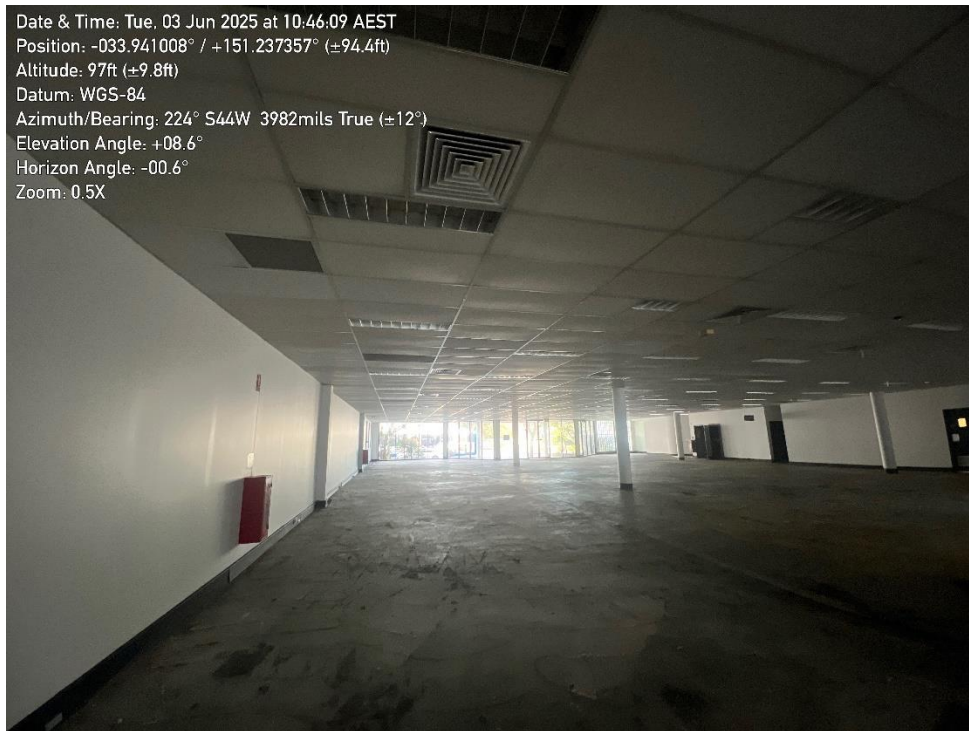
Interior view of the building at 138 Maroubra Road, looking toward the glazed façade and adjoining landscape bed. The sealed ceiling structure and intact windows prevent fauna access.
